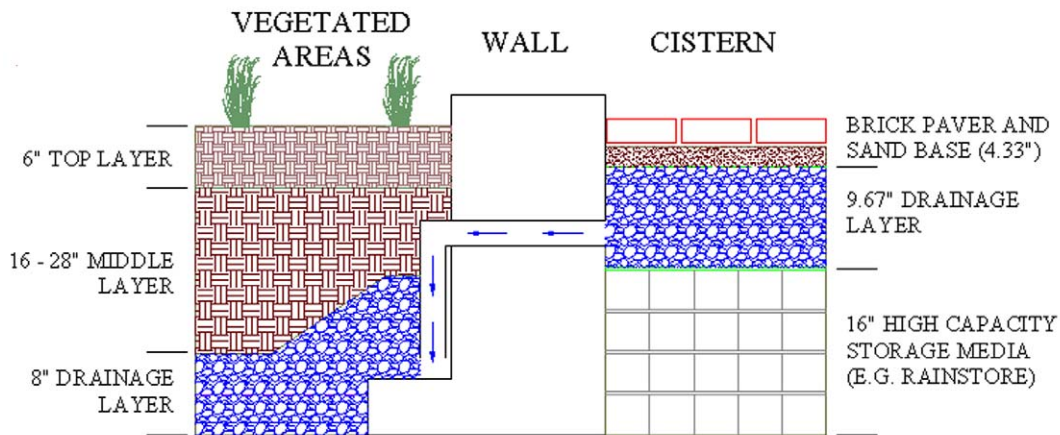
Cross-section detail showing storage of roof runoff beneath brick walkway using RainStore units.
